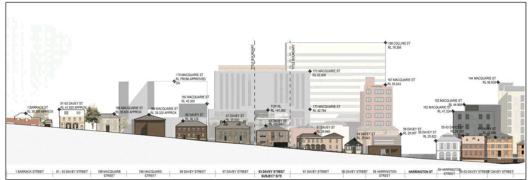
The proposed development (centre) inserted into the Davey Street streetscape context, highlighting the front podium element in the immediate streetscape (Source: JAWS Architects).
